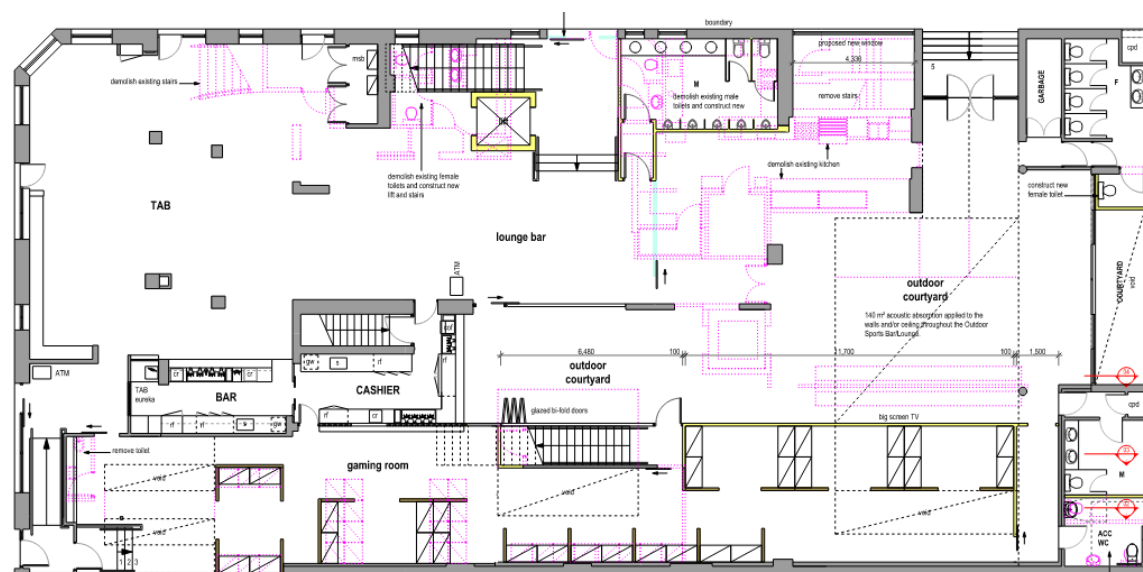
Proposed ground floor plan (Source: Darren Mah Design)
